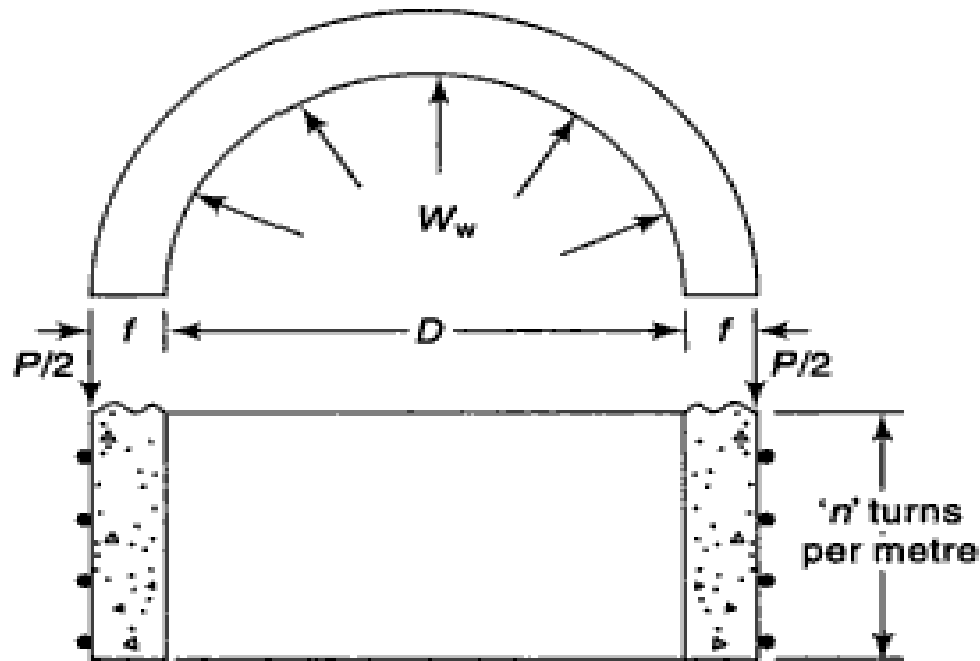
Circumferential Winding in Prestressed Pipes
